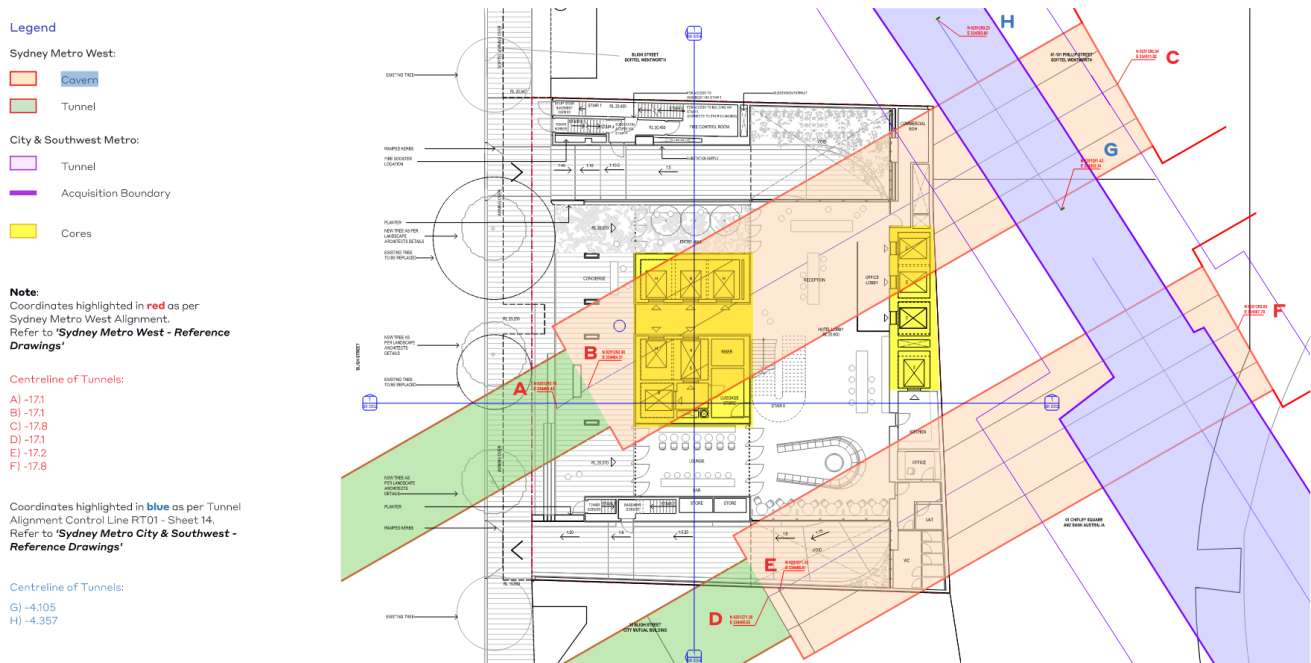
Site Aerial View and Sydney Metro Tunnel Locations.
